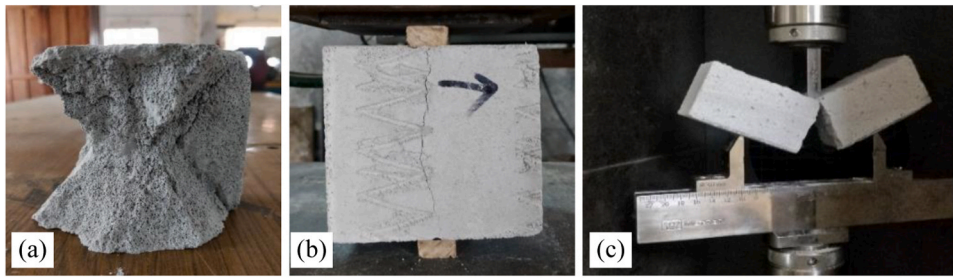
(a) Uni-axial compression, (b) splitting tensile, and (c) three-point bending test of AAC block units.
